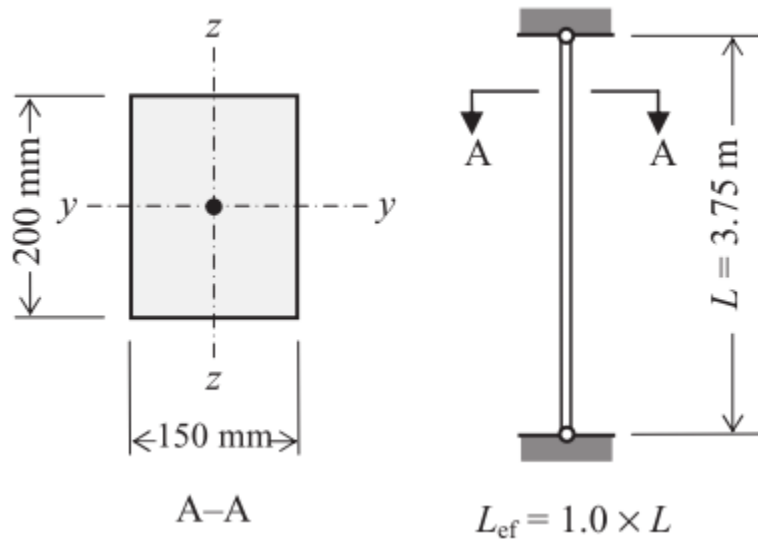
Solid timber column section laminated with CFRP (Sources; Structural Timber Design to Eurocode 5, Jack Porteous and Abdy Kermani).
